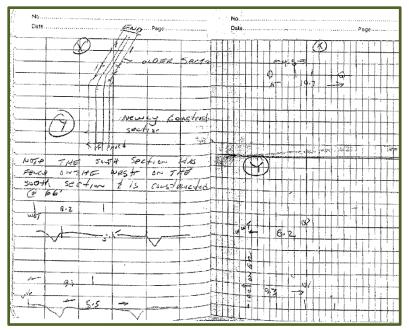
(Field Notes of East Suffolk Road Extension, Suffolk, Prince Edward Island)
